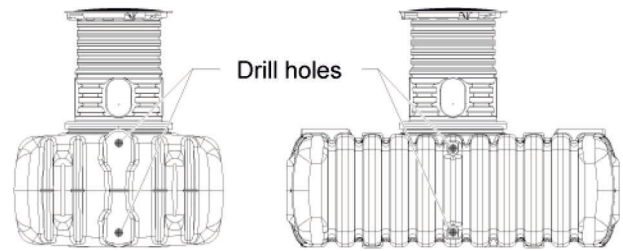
Drill holes for interconnecting multiple tanks – FLAT
